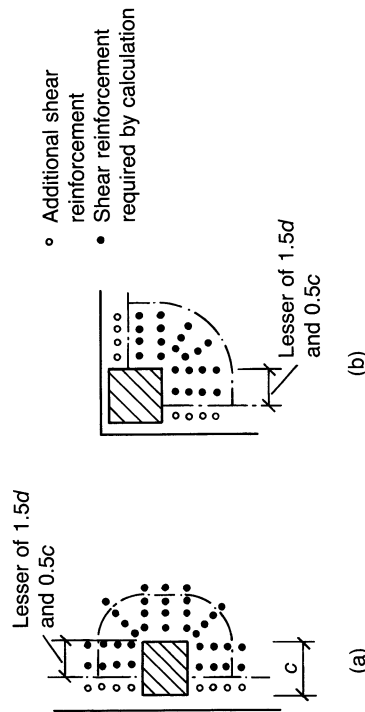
Shear reinforcement at edge and corner columns
